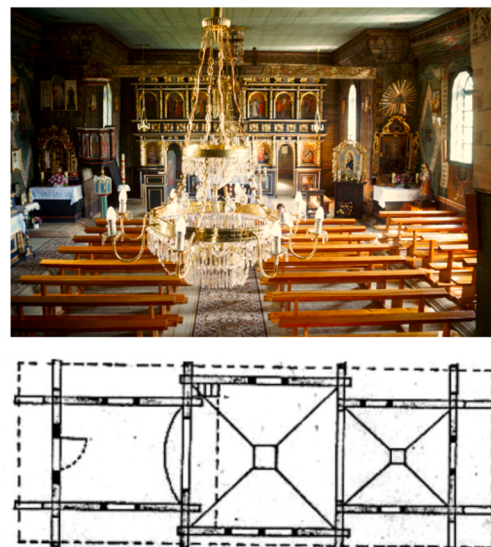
Interior photograph and floor plan of St. Michael the Archangel Church in Brunary.
